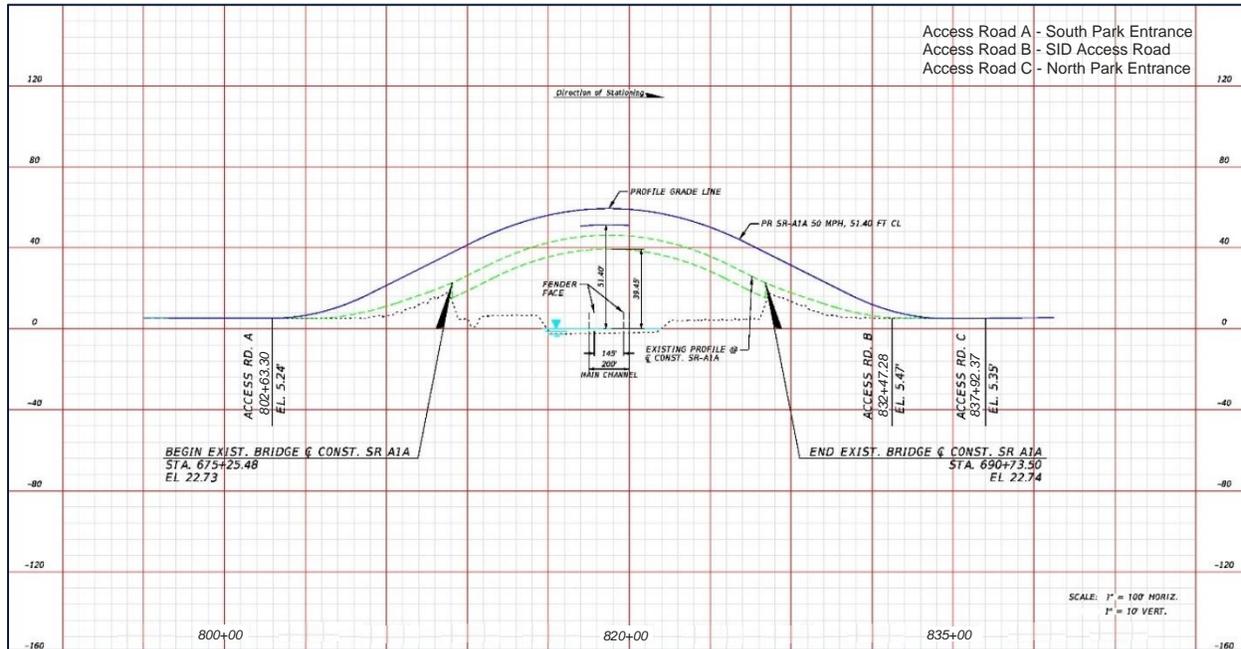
PREFERRED ALTERNATIVE BRIDGE PROFILE
